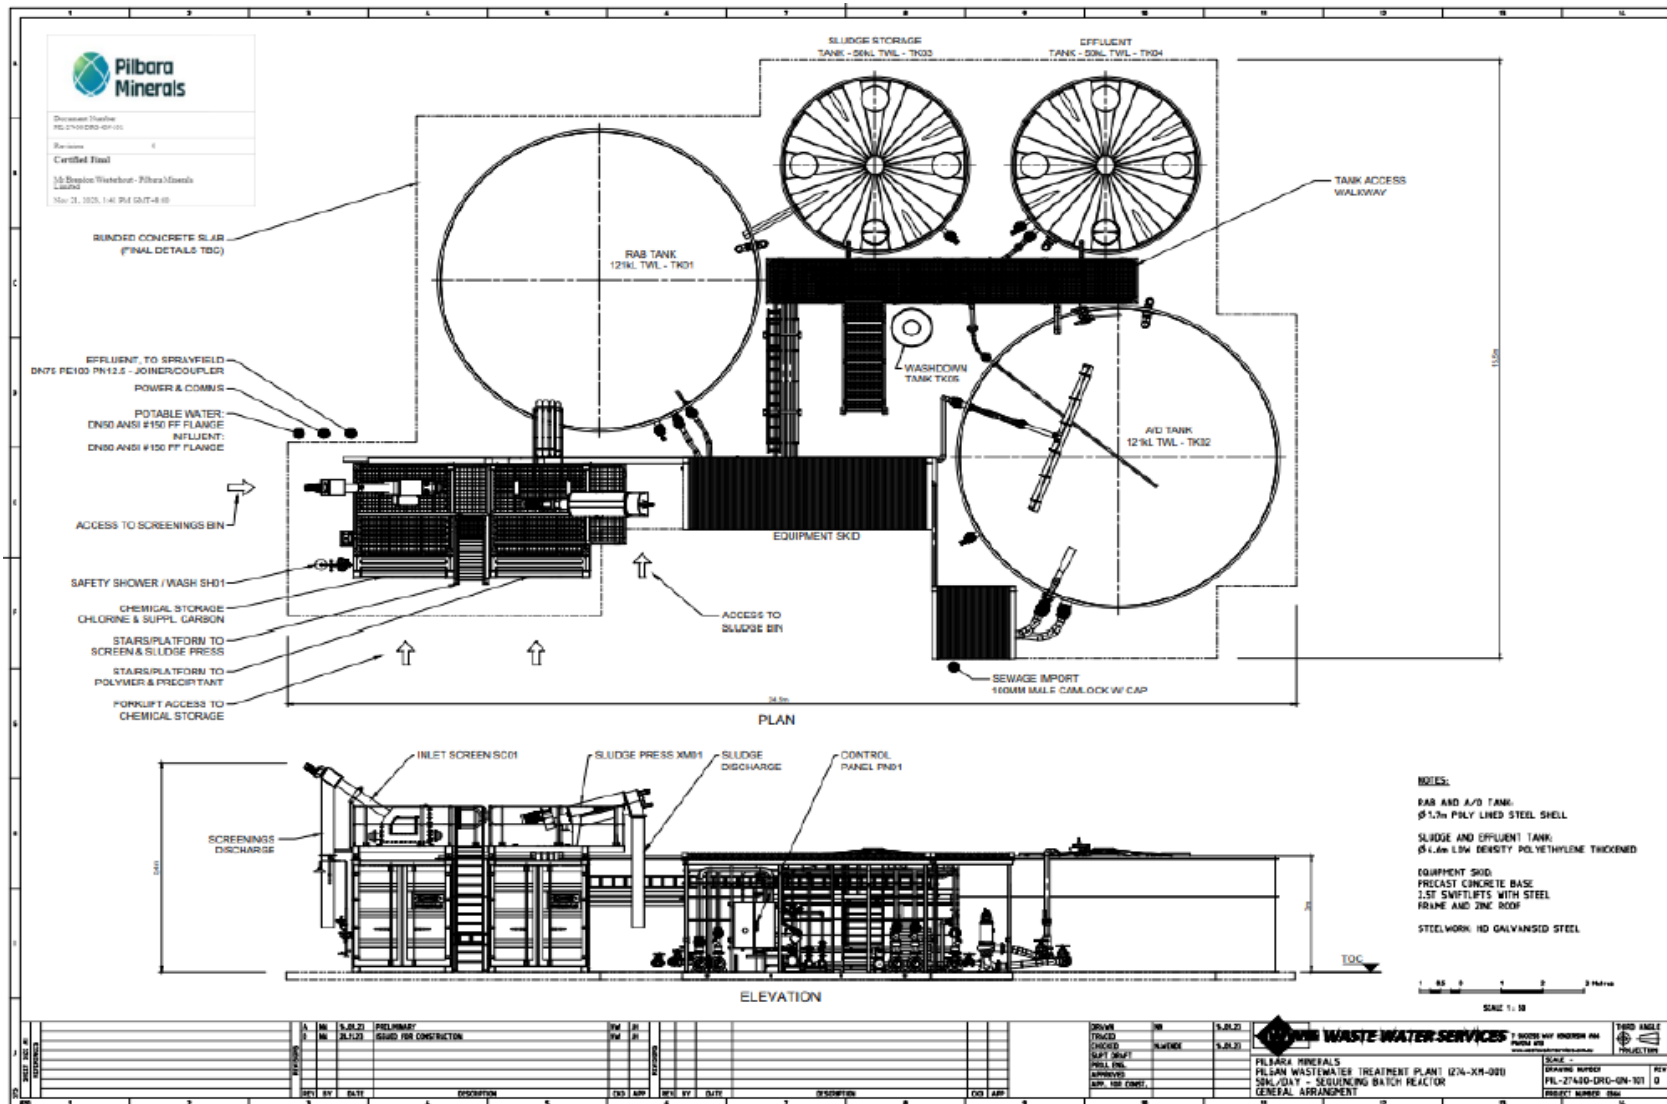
Pilgan Processing Plant WWTP General Arrangement
